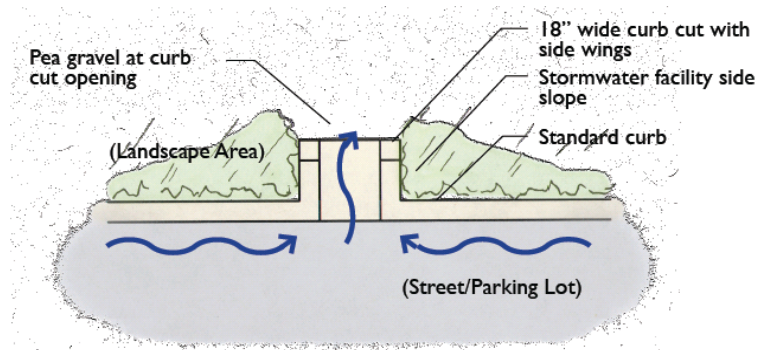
Standard curb cut with side wings: plan view (Source: SMCWPPP 2009)
